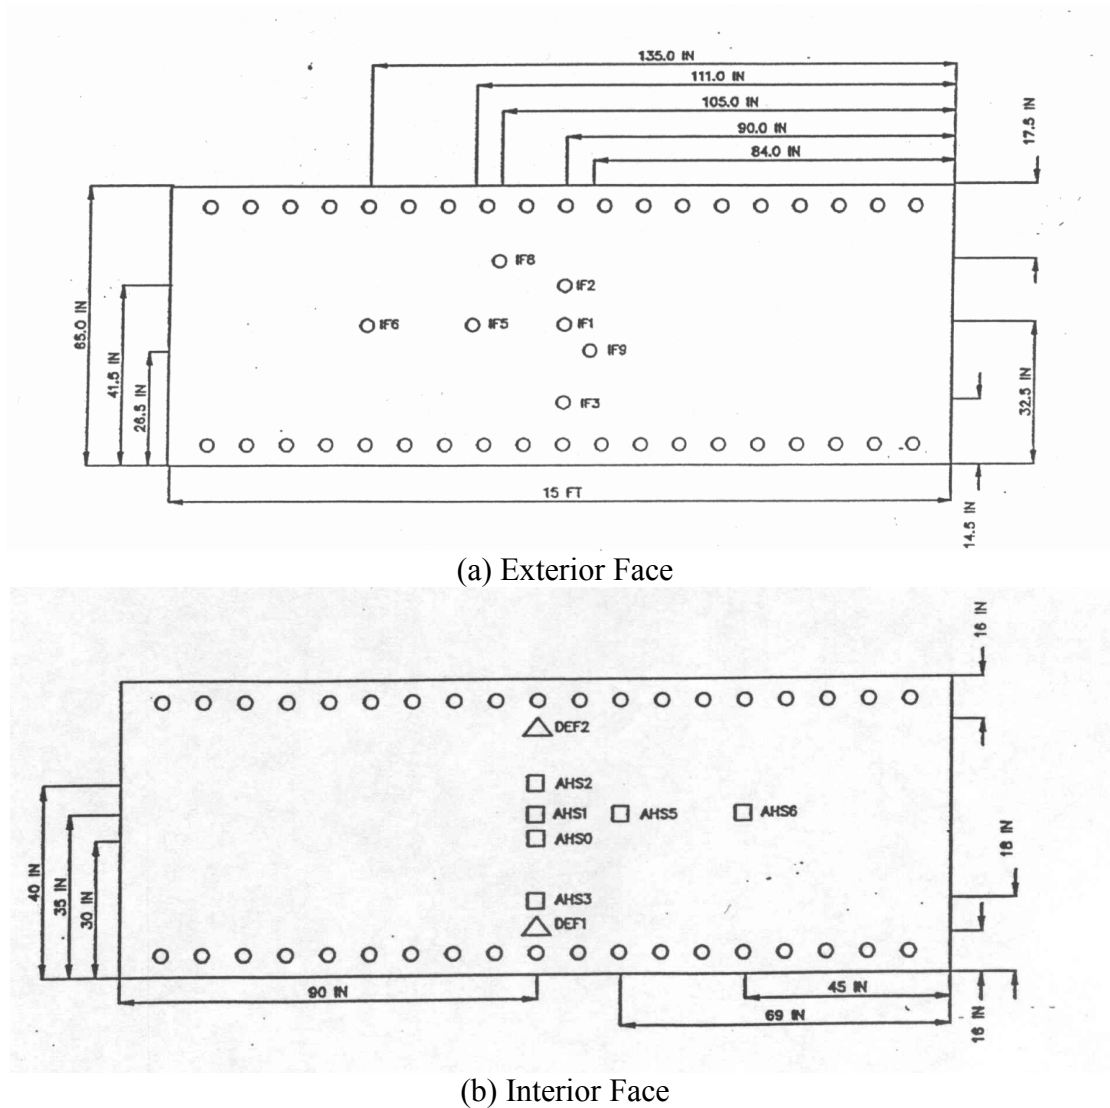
Instrumentation Plan for the Reinforced Concrete Slab. IF refers to interface stress gages mounted on the structure, AHS and AVS refer to accelerometers mounted on the interior surface of the test structure which measure horizontal and vertical motion, respectively (Courtesy of Baylot (1993)).
